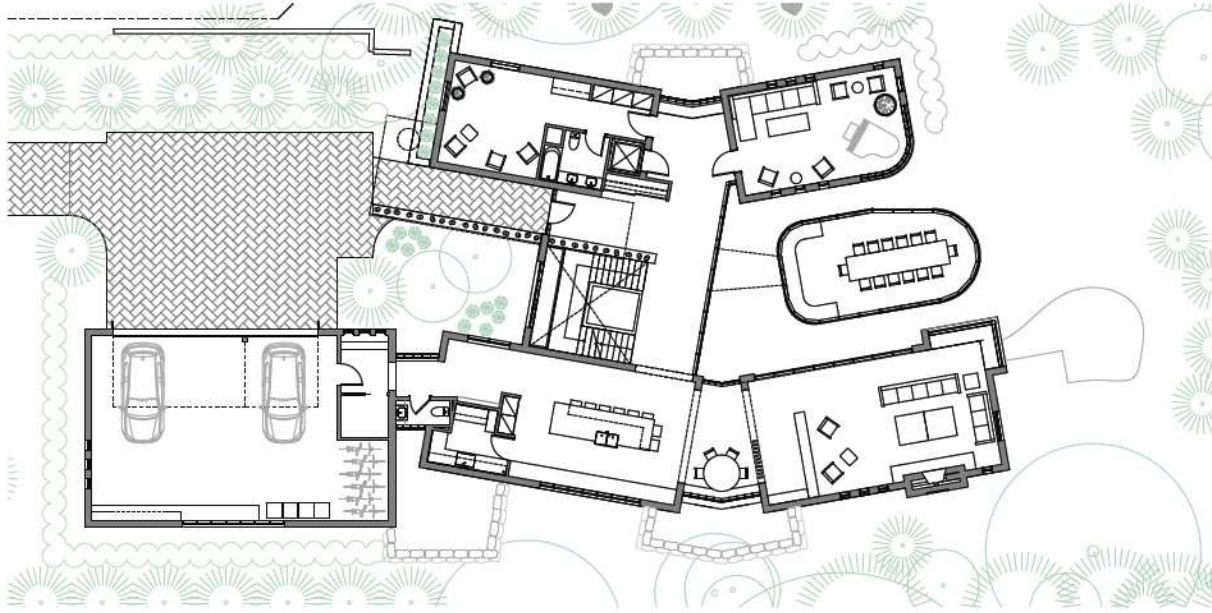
Ground floor plan. Source Linebox Studio 2023.
